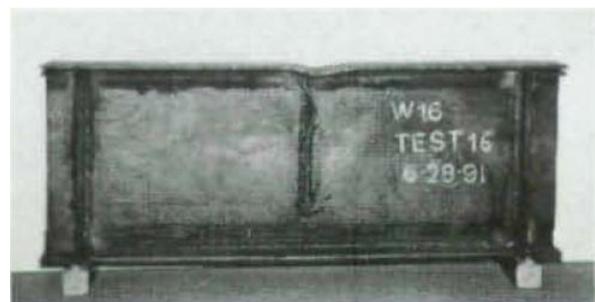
Failure mode 3—global stiffener crippling (test 16).
